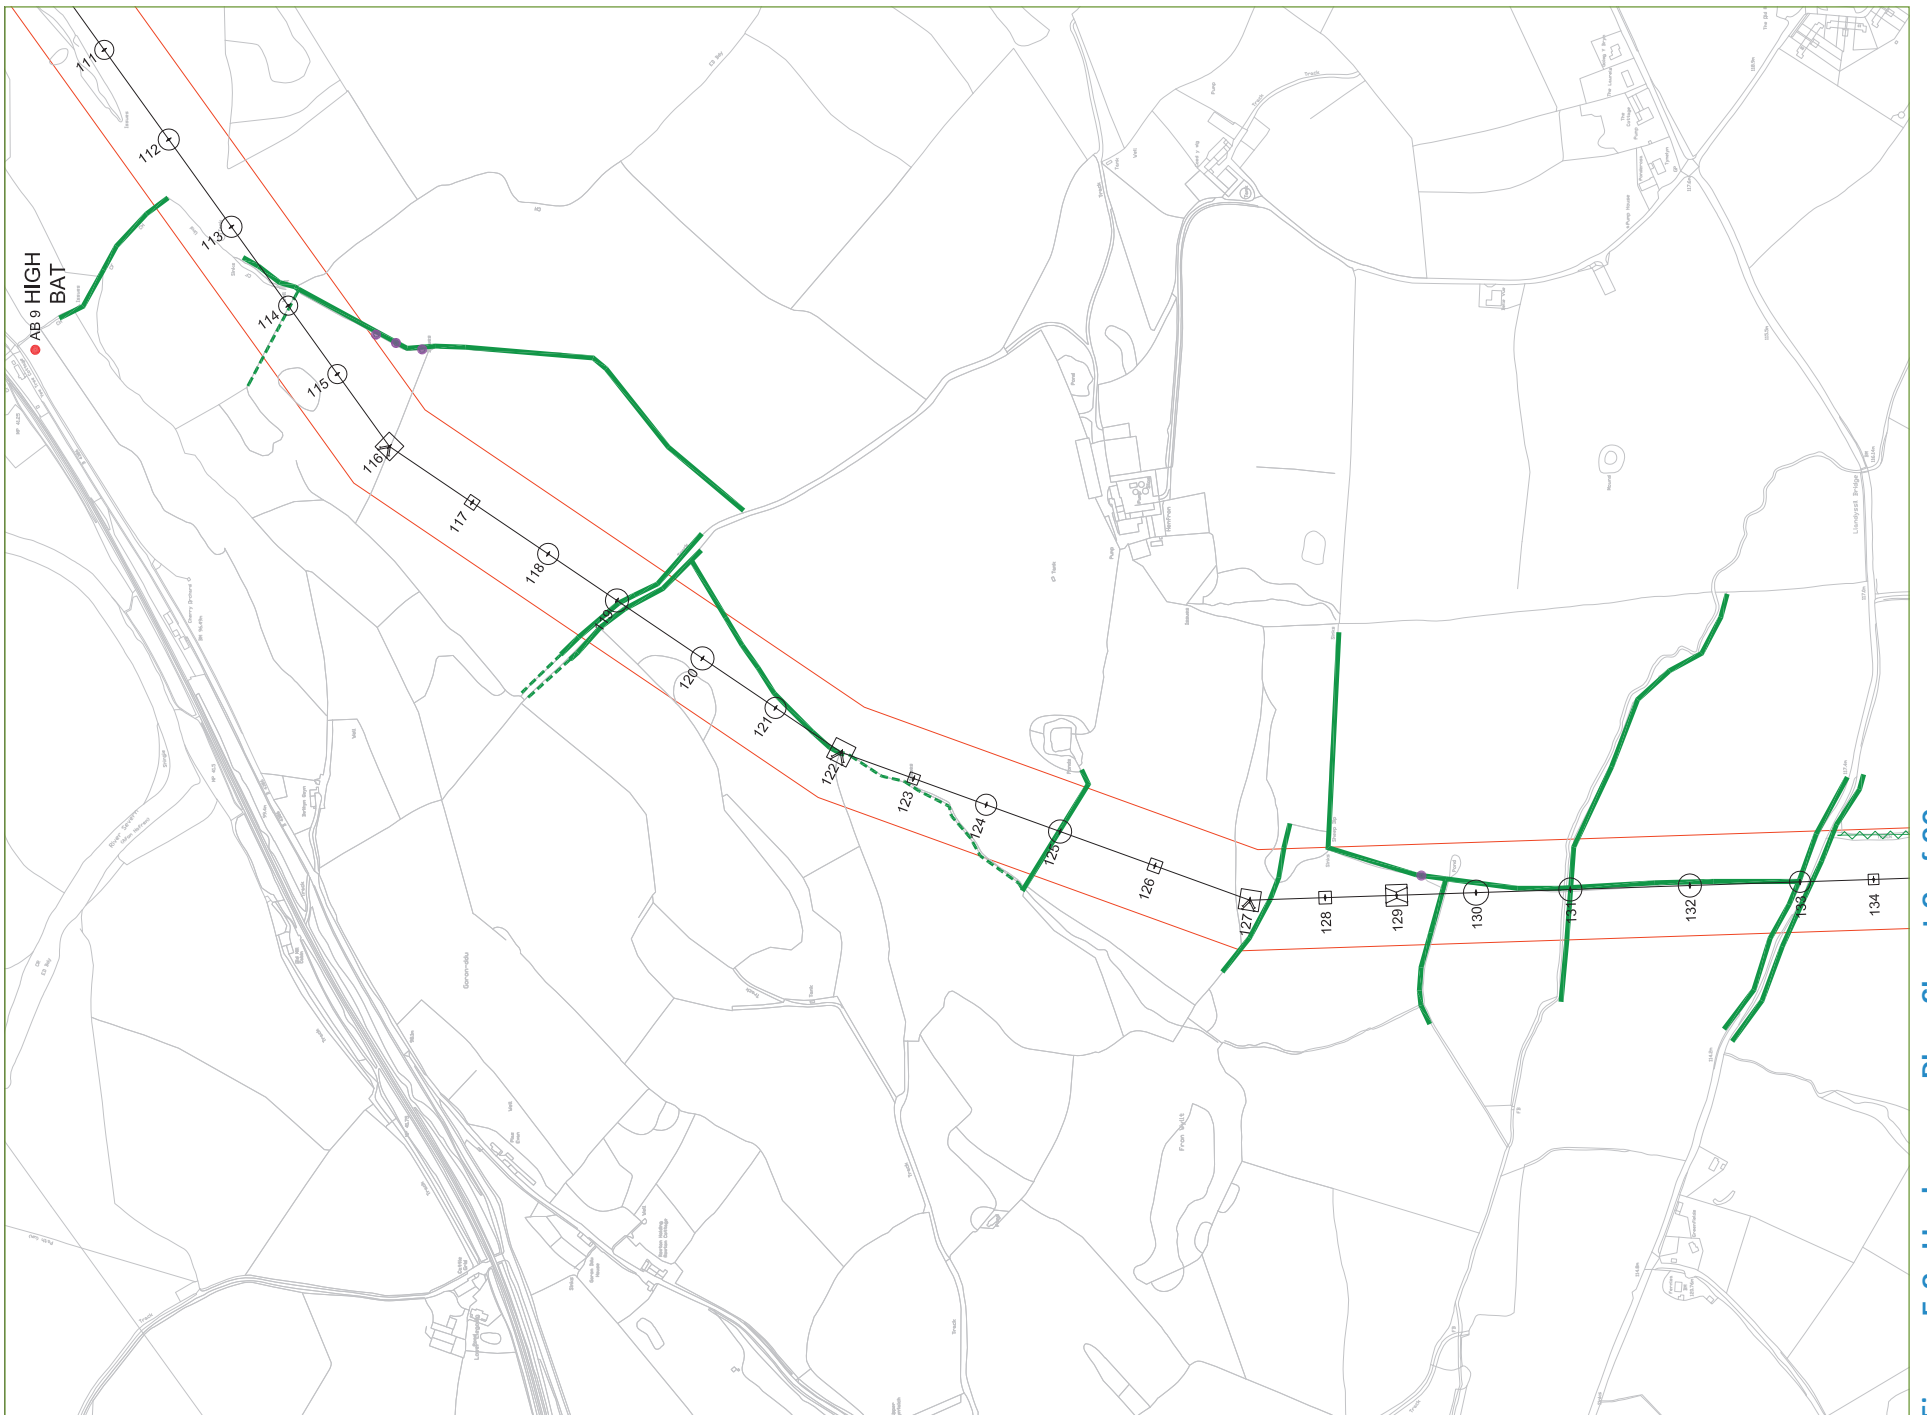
Hedgerow Plan Sheet 9 of 20
